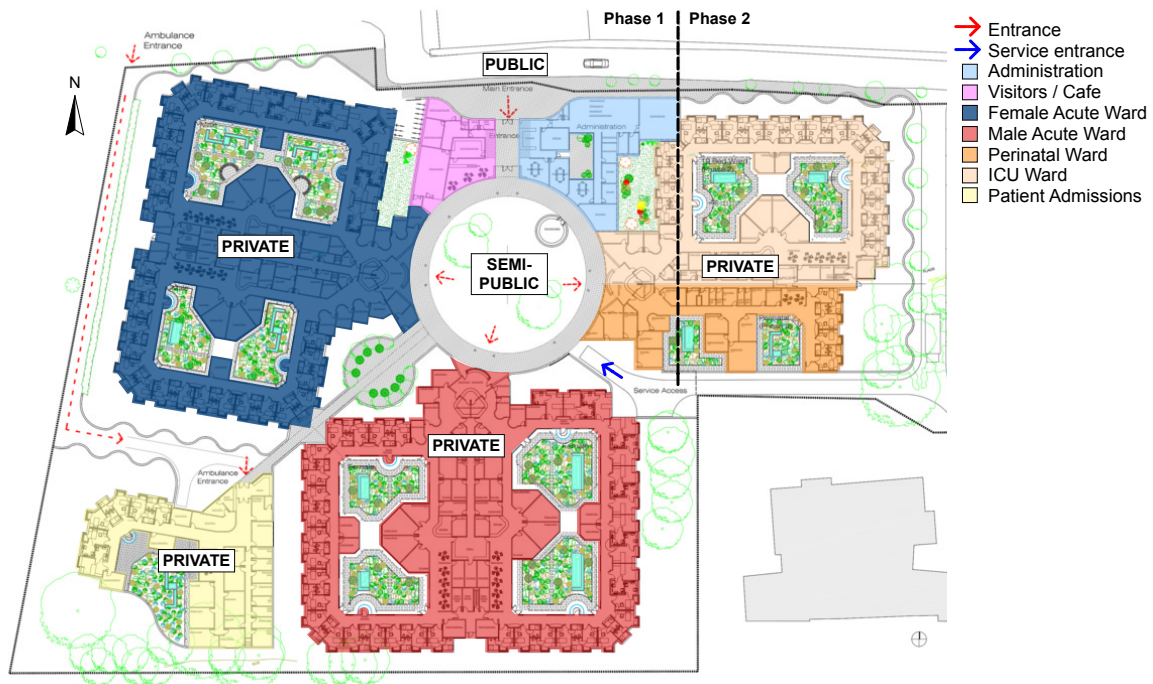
Adapted Concept Plan - Richard Murphy Architects. Author's own, 2016.
